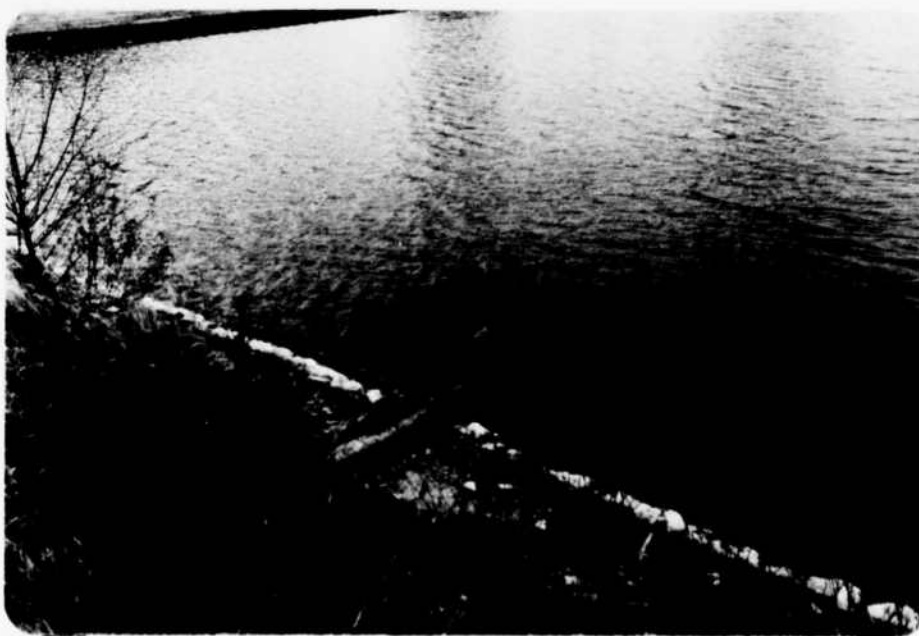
INLET OF PIPE SPILLWAY
